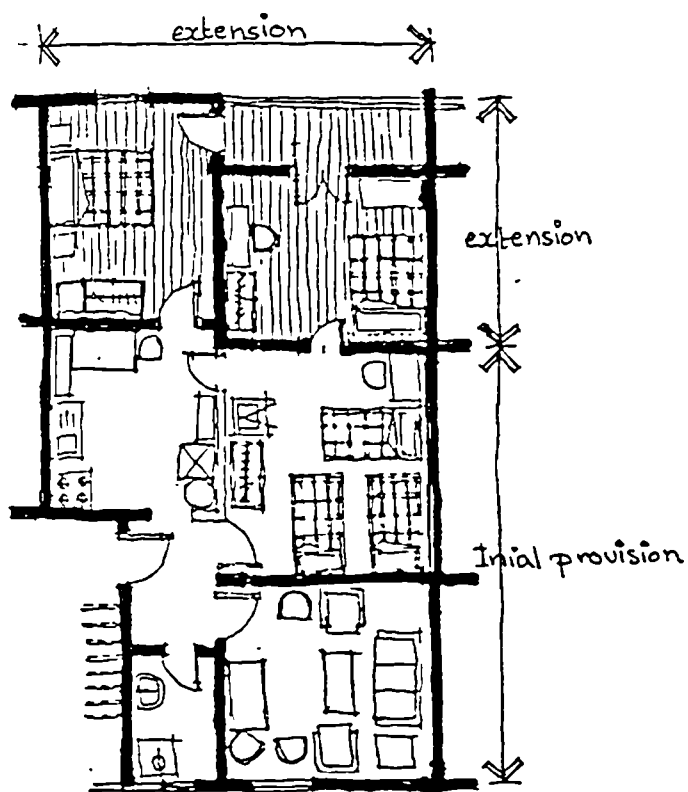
Plan of Hassan's housing unit. (Ground floor). The extension consists of one room and a balcony within the five storey communally built extension to the rear of the block. The structure is a concrete skeleton frame. Hassan also has built a front extension out of load bearing brickwork for a kitchen.
